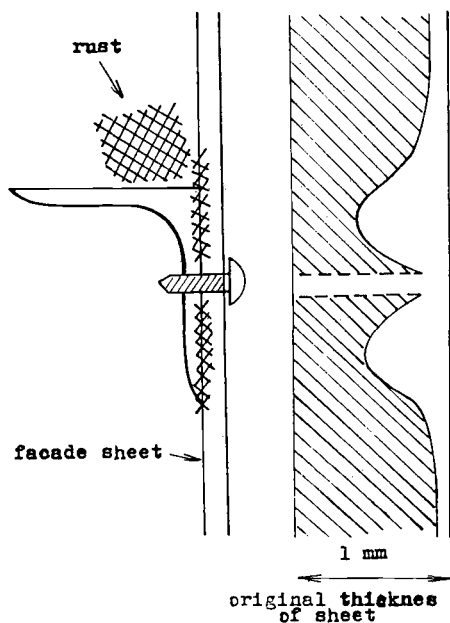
Corrosion behavior of the façade sheet attachment on the supporting structure.
